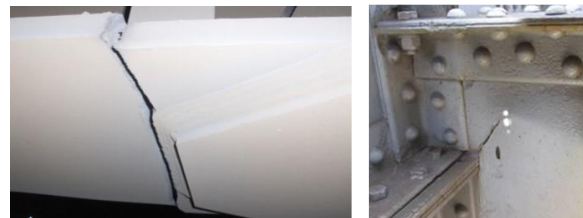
Illustrations of crack formation in complex welded steel structures: crane-way girder at AM (left) and railway bridge at Infrabel (right)
